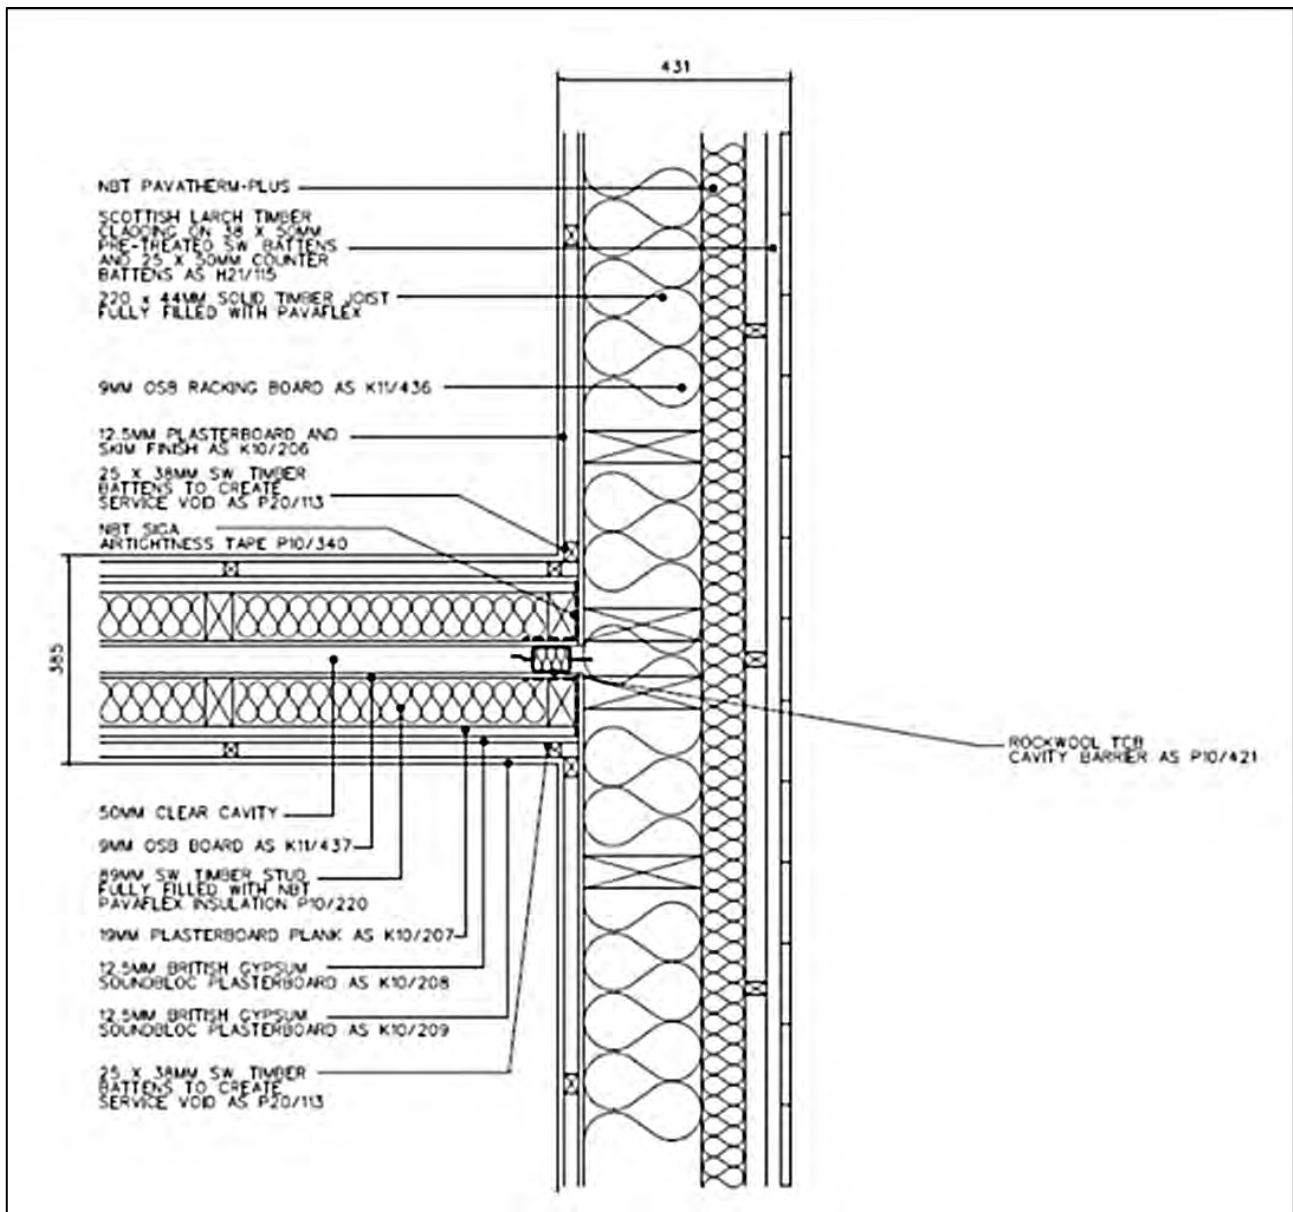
Construction Drawing, External Wall Corner Detail Plan (19 May 2011)
